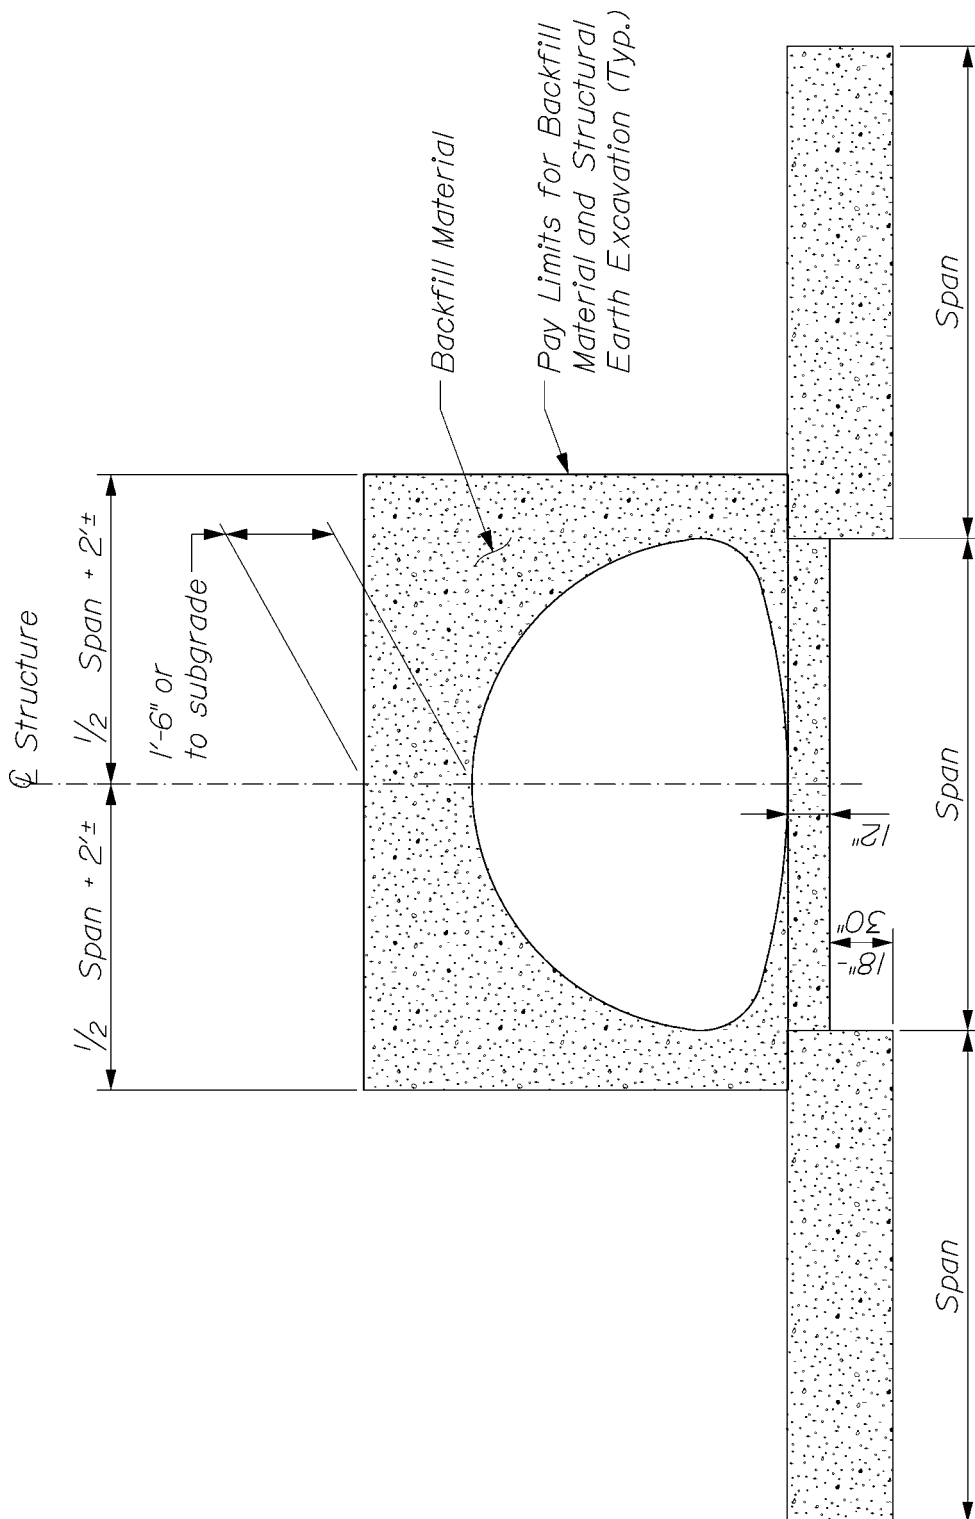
Excavation and Backfill Limits for Pipe or Pipe Arch Structures - Soft Soils
